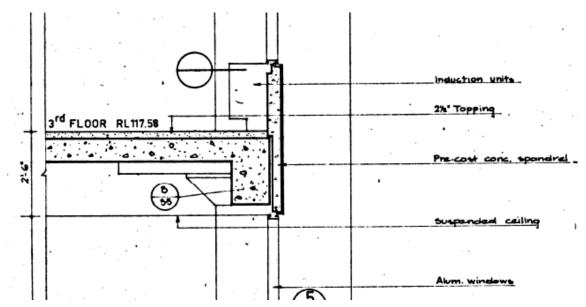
Drawing 38528-48, Building Application Plan, showing pre-cast concrete spandrel (BAP).
